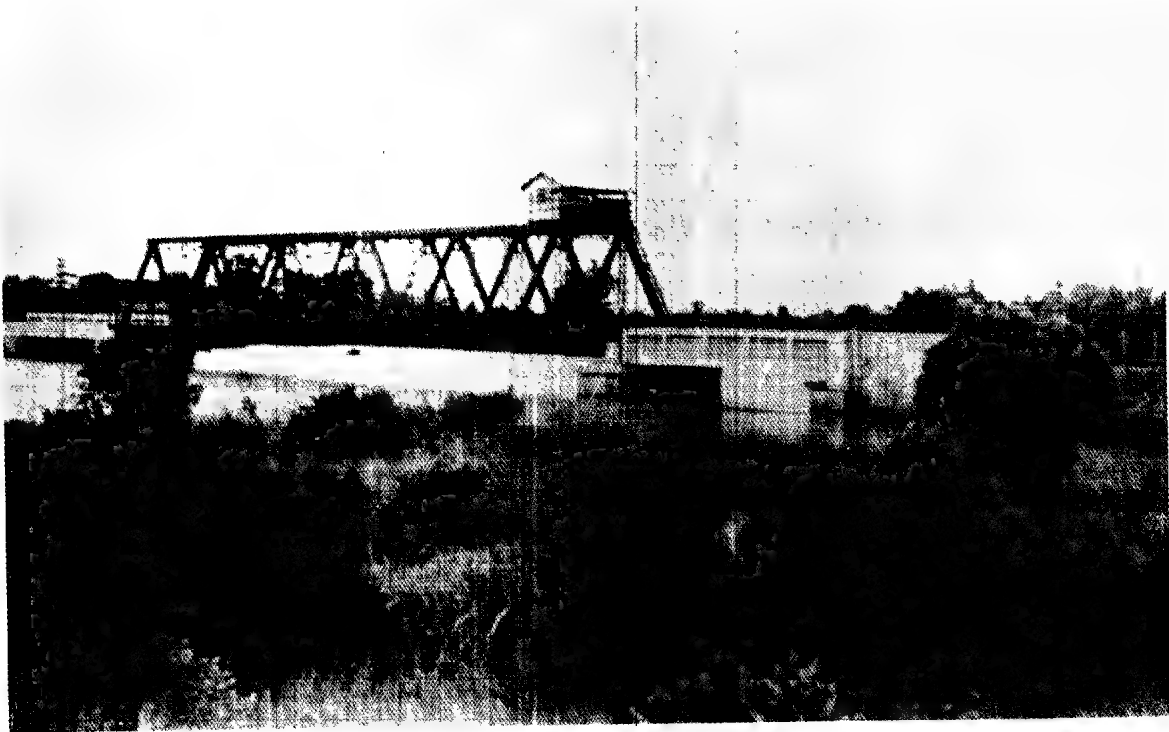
Railroad bridge west of Sisophon. Note guard tower.
